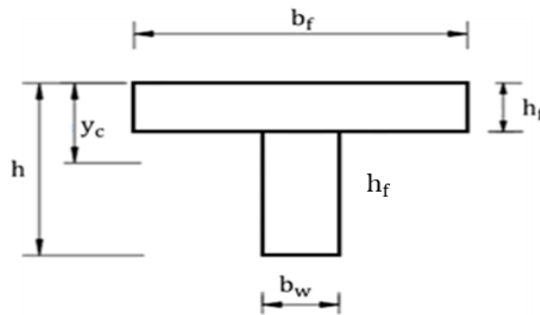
Cross section of the ribbed slab (Author (2018)).
